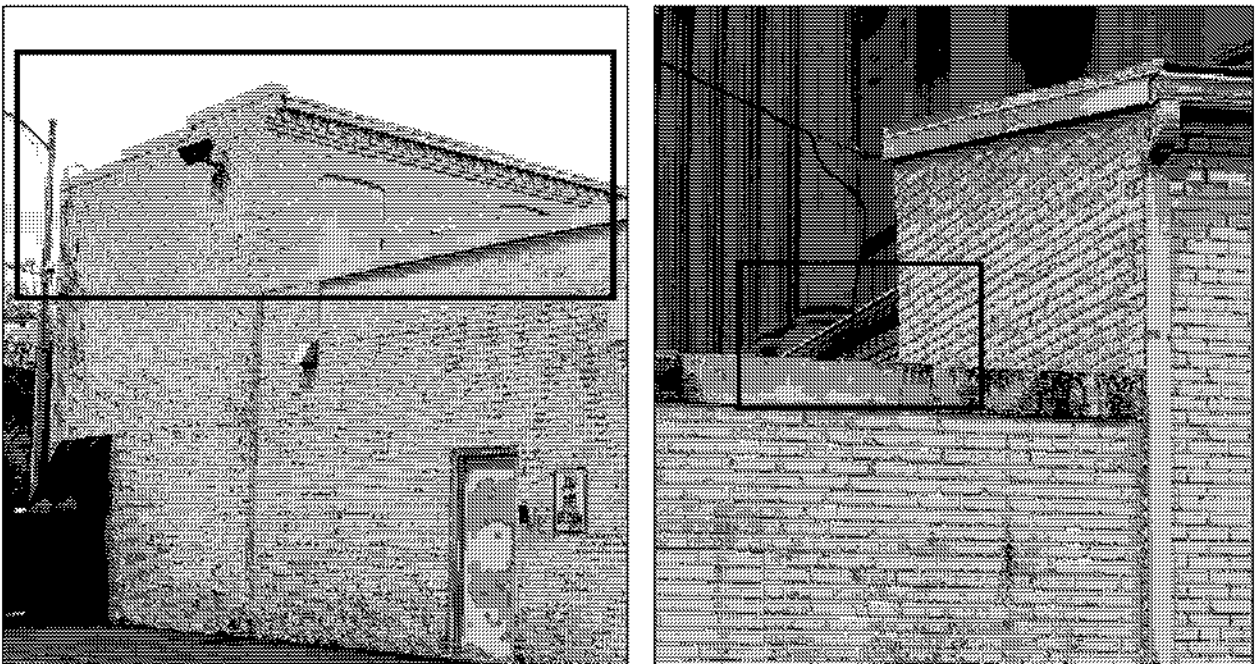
Details of the shed roofline and corbeled cornices at the 1883 and c. 1887-1888 portions of the building are highlighted in red. EHT Tracerics.
